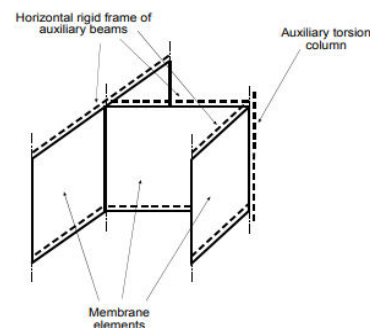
Membrane Elements with Rigid Beams at Floor Levels and Auxiliary Torsion Column
